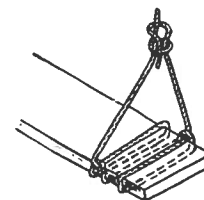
Scaffold hitch. For suspending a scaffold plank. Will prevent plank from tilting. Can also be used on plank on edge.
